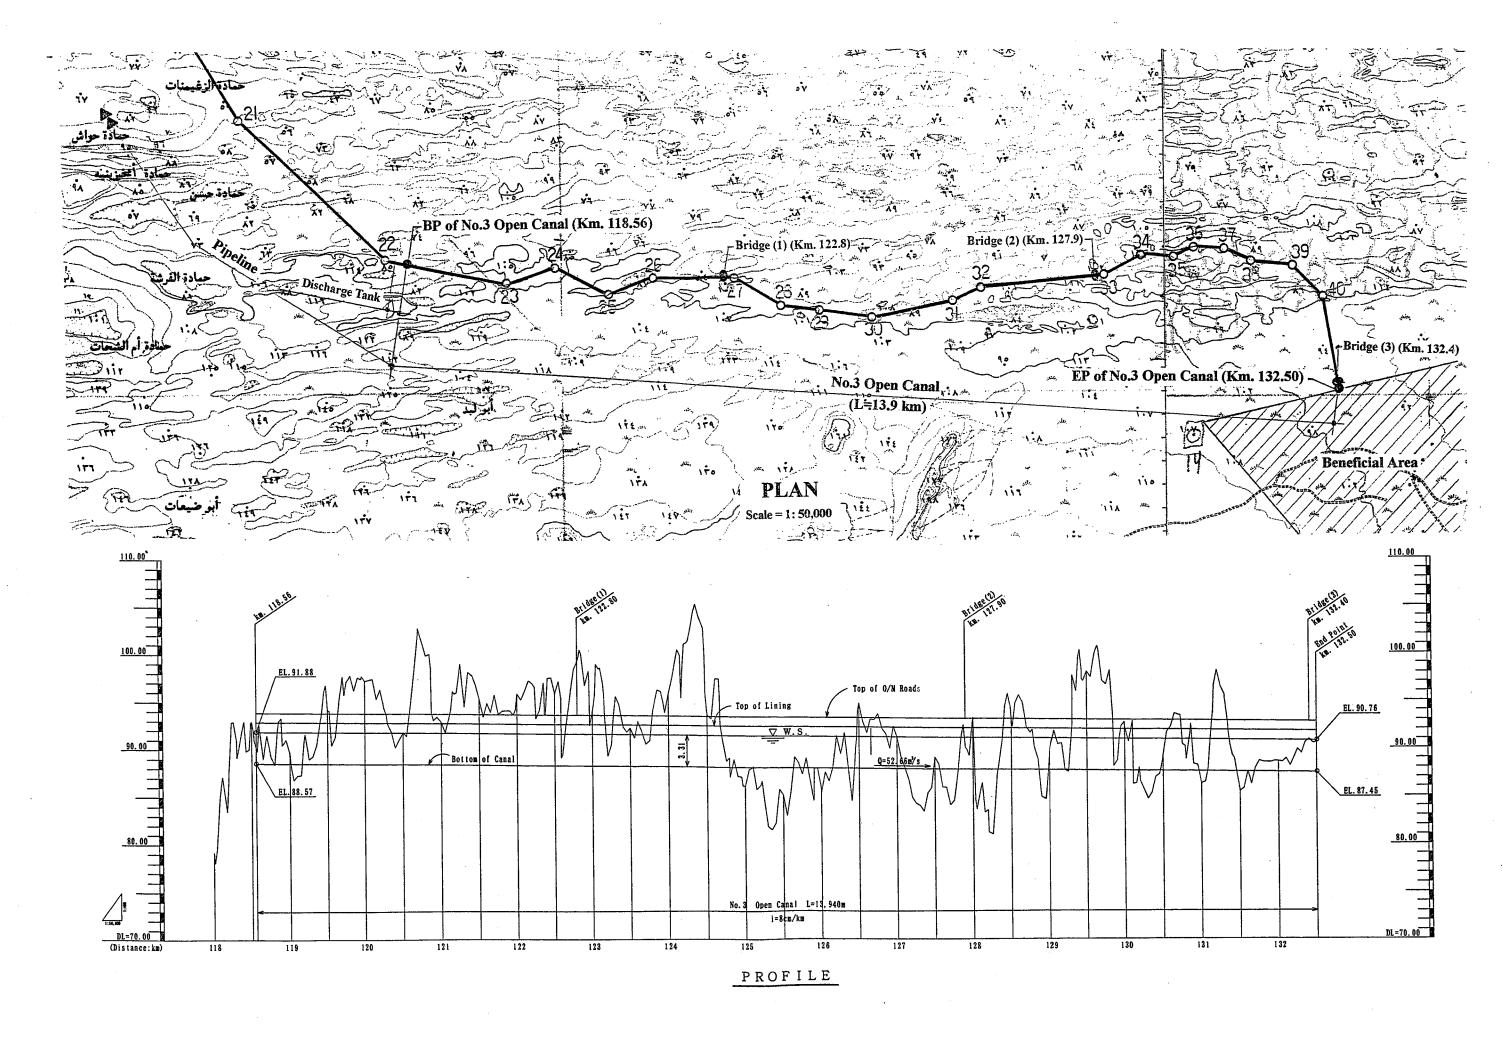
Plan and Profile of No.3 Open Canal
